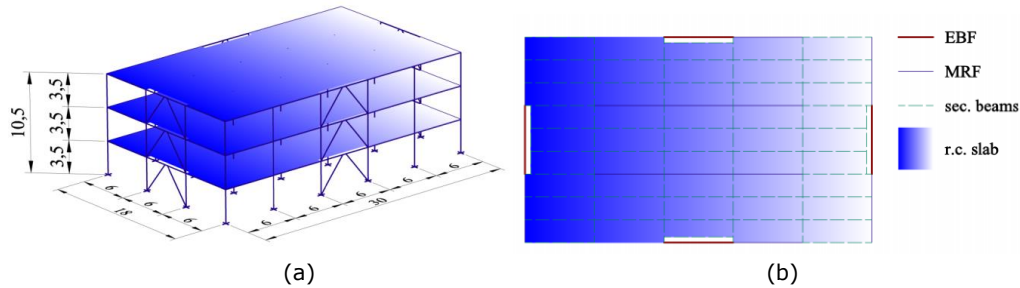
3D view (a) and plan layout (b) of the prototype structure.
